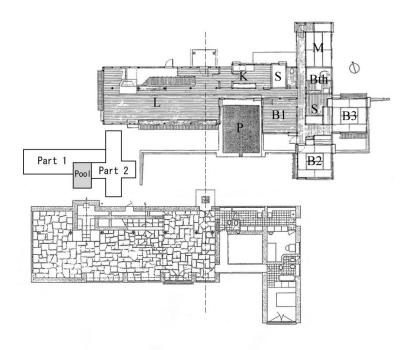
Plans of Karuizawa house (above) and Errazuris house (below) 1/500.
